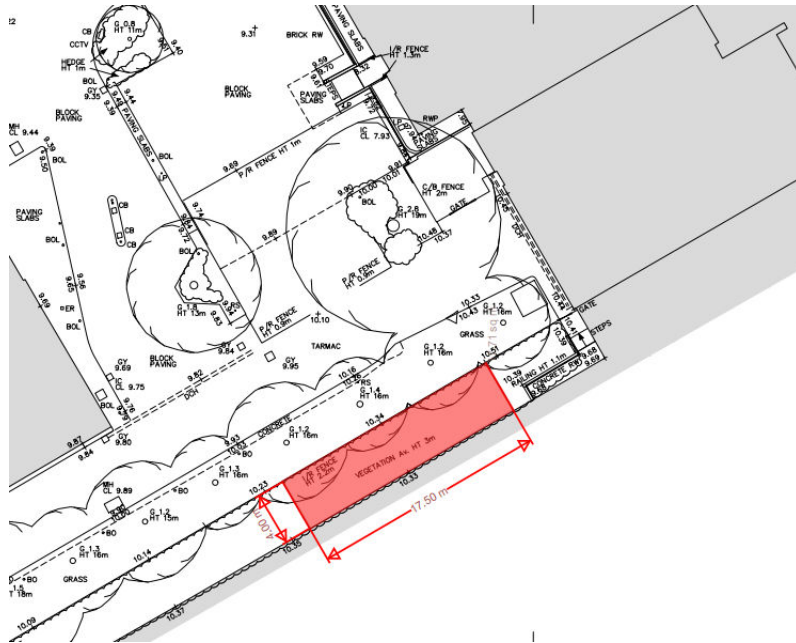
ASHP Location 2 with 17.5x4m Arrangement (Drawing scale 1:200)
